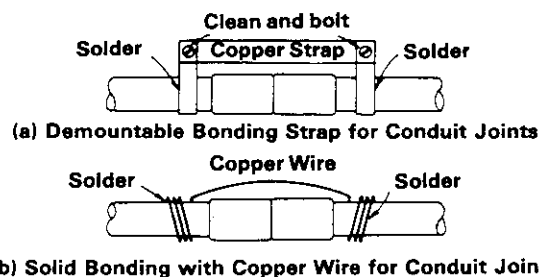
Two Recommended Methods For Electrical Bonding Across Poor Conductivity Conduit Joints
